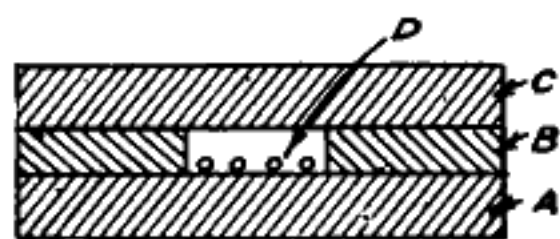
Section of conduit for protecting leading wires or cordeau for tunnel or gopher hole blasts. "A." A heavy board for bottom. "B." Piece of 1 inch x 4 inch board. "C." A heavy board for top. "D." Leading wire or cordeau protected from injury. Such a conduit is placed on the floor of the tunnel.
